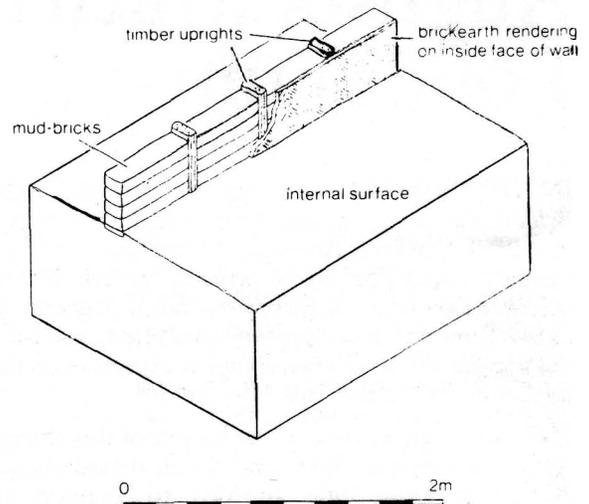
cross-section through mud-brick/timber wall to show technique of construction.
